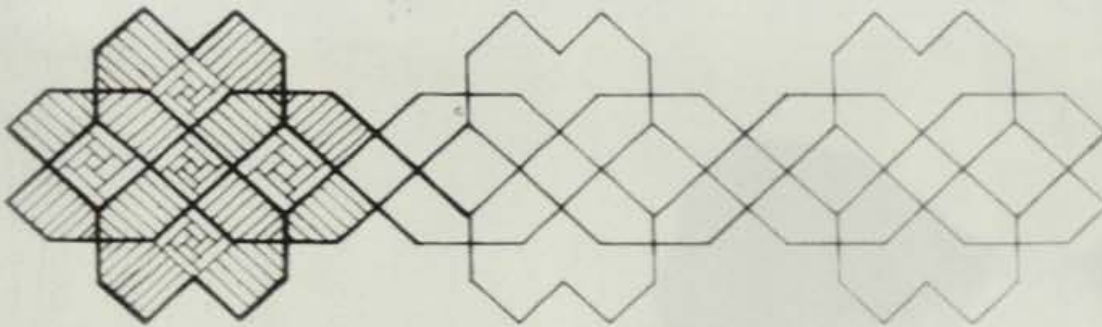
Wazir Khan Mosque, Lahore - cut and dressed flooring in geometrical pattern.
